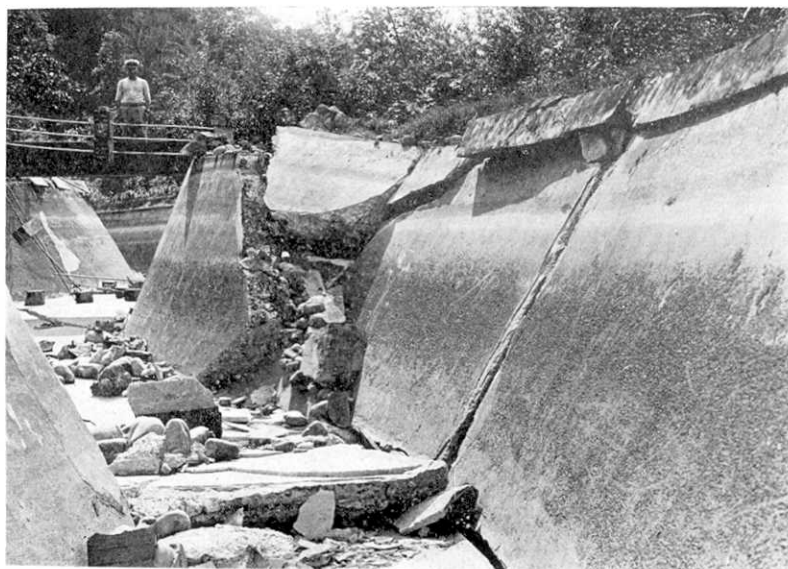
Damages of a pier of the Taiankei railway bridge.
